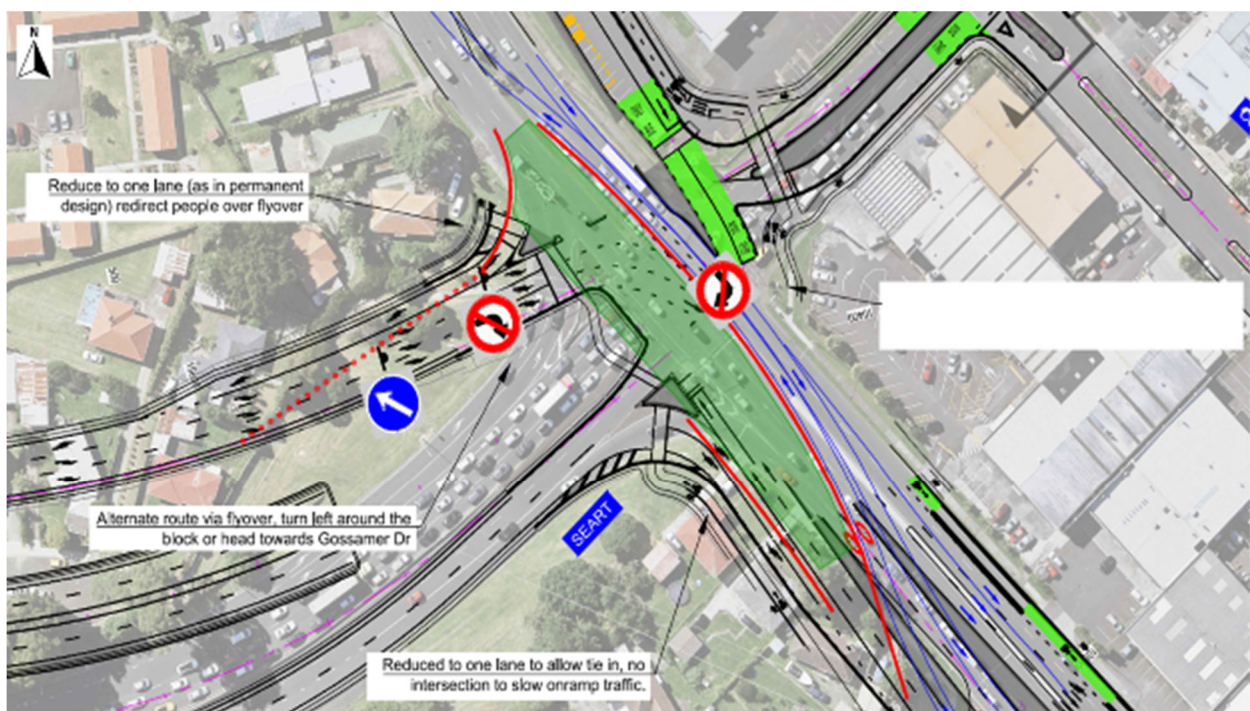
Ti Rakau Dr / Reeves Rd proposed layout during construction
